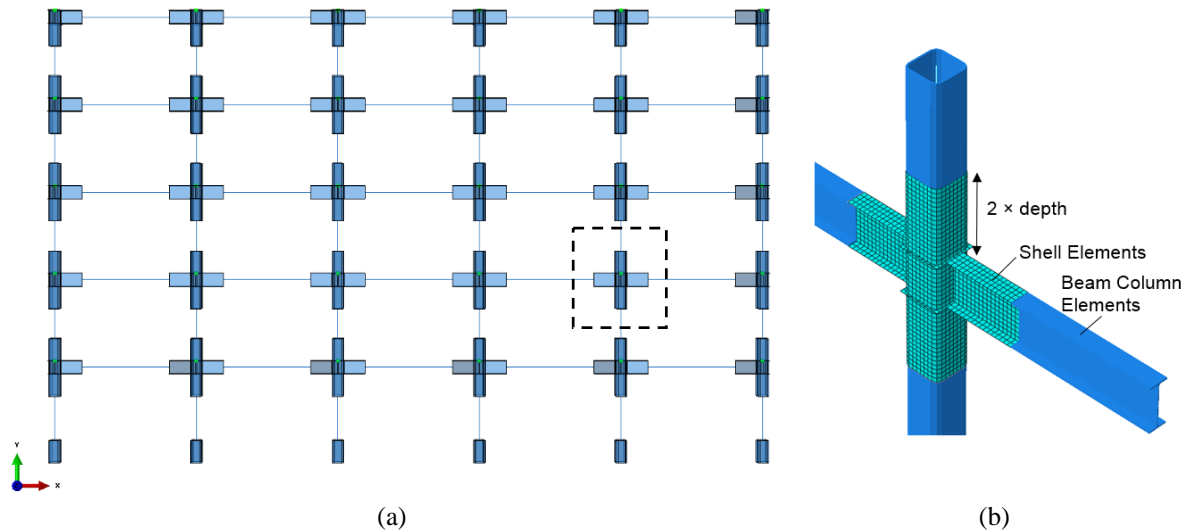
(a) Overall view of the frame model in Abaqus; and (b) Modelling details of a beam-column connection.
